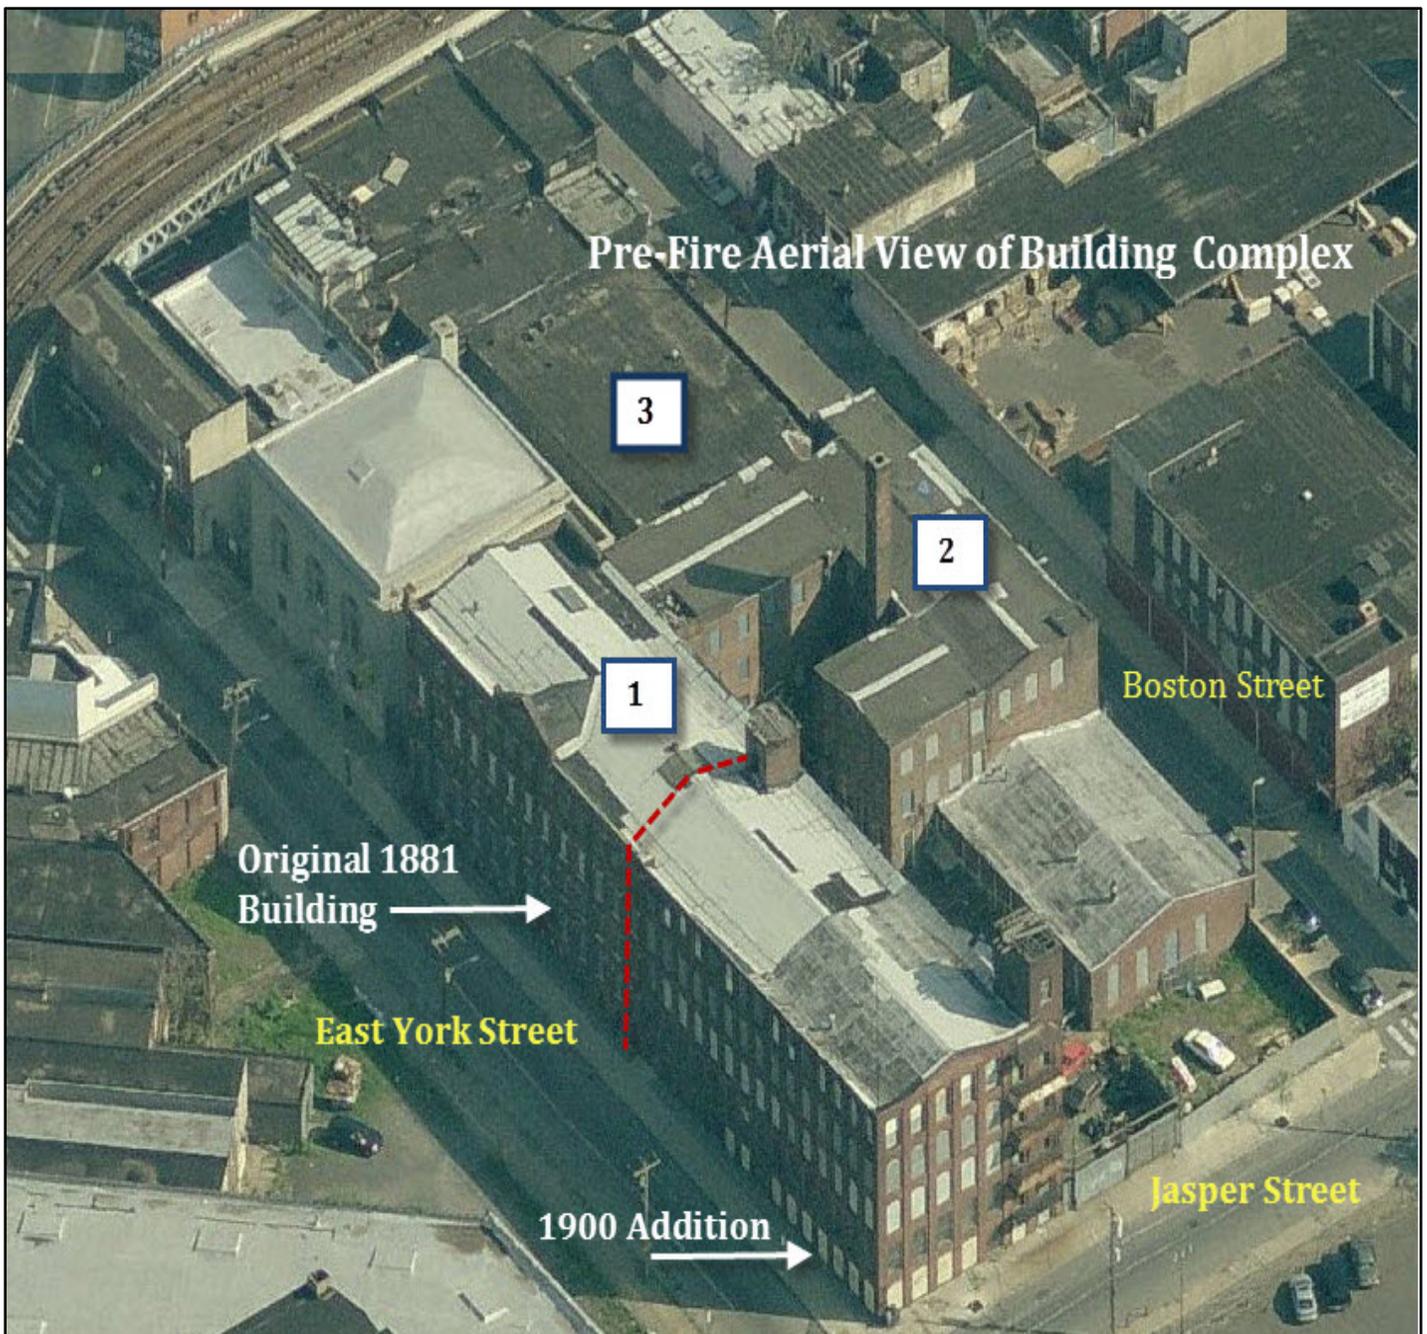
Pre-fire aerial view of building complex showing the building of origin (1), and the building that collapsed (2) onto the roof of the furniture store showroom (3).
